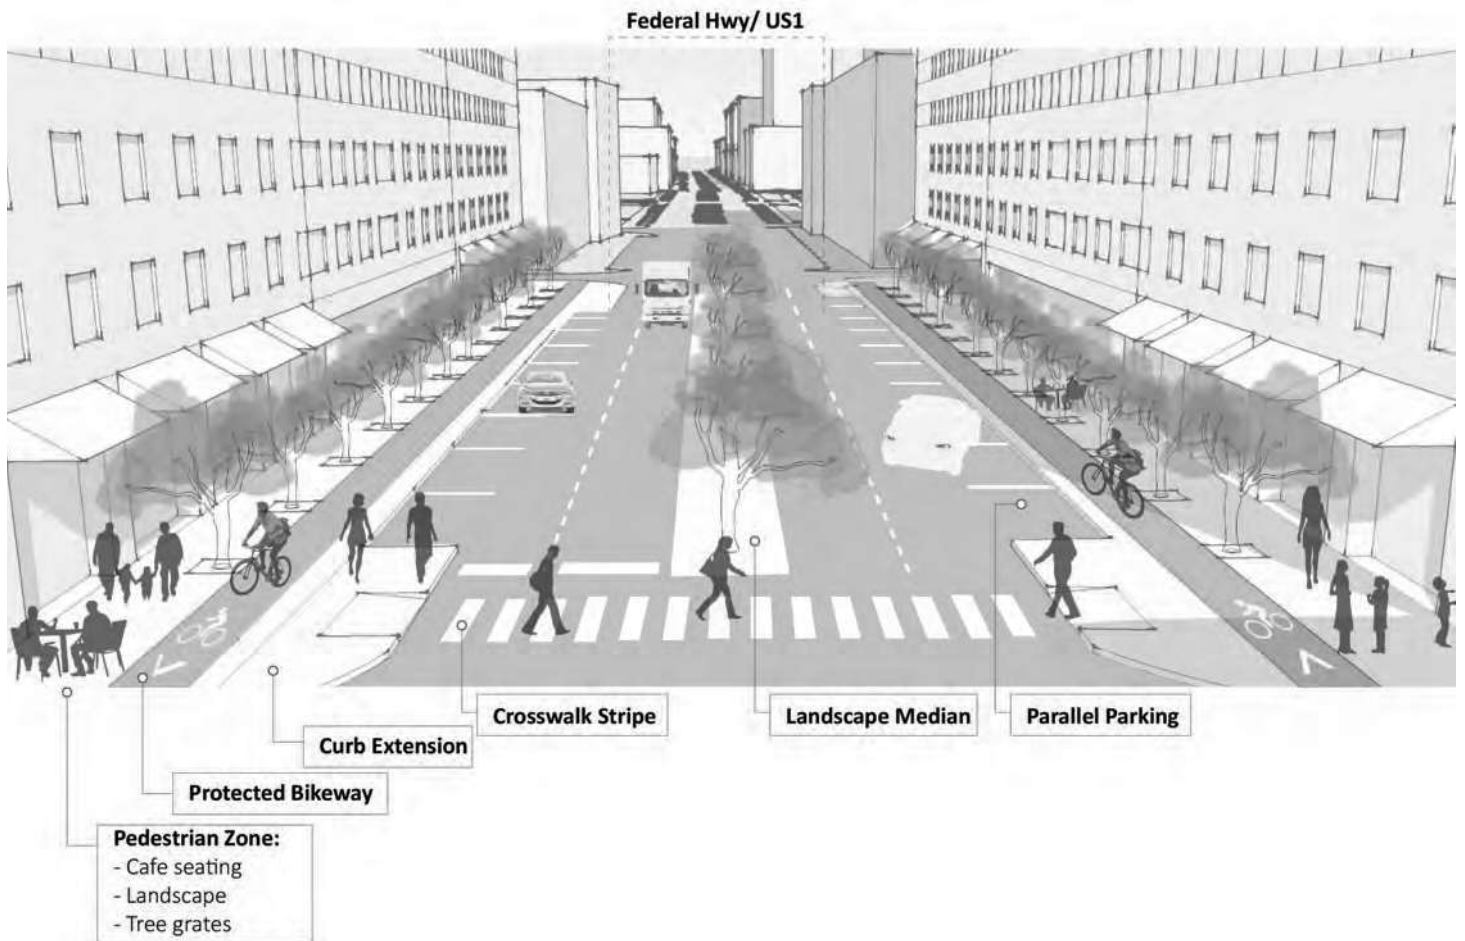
Federal Hwy Streetscape Diagram - Alternative 2: On-Street Parking
